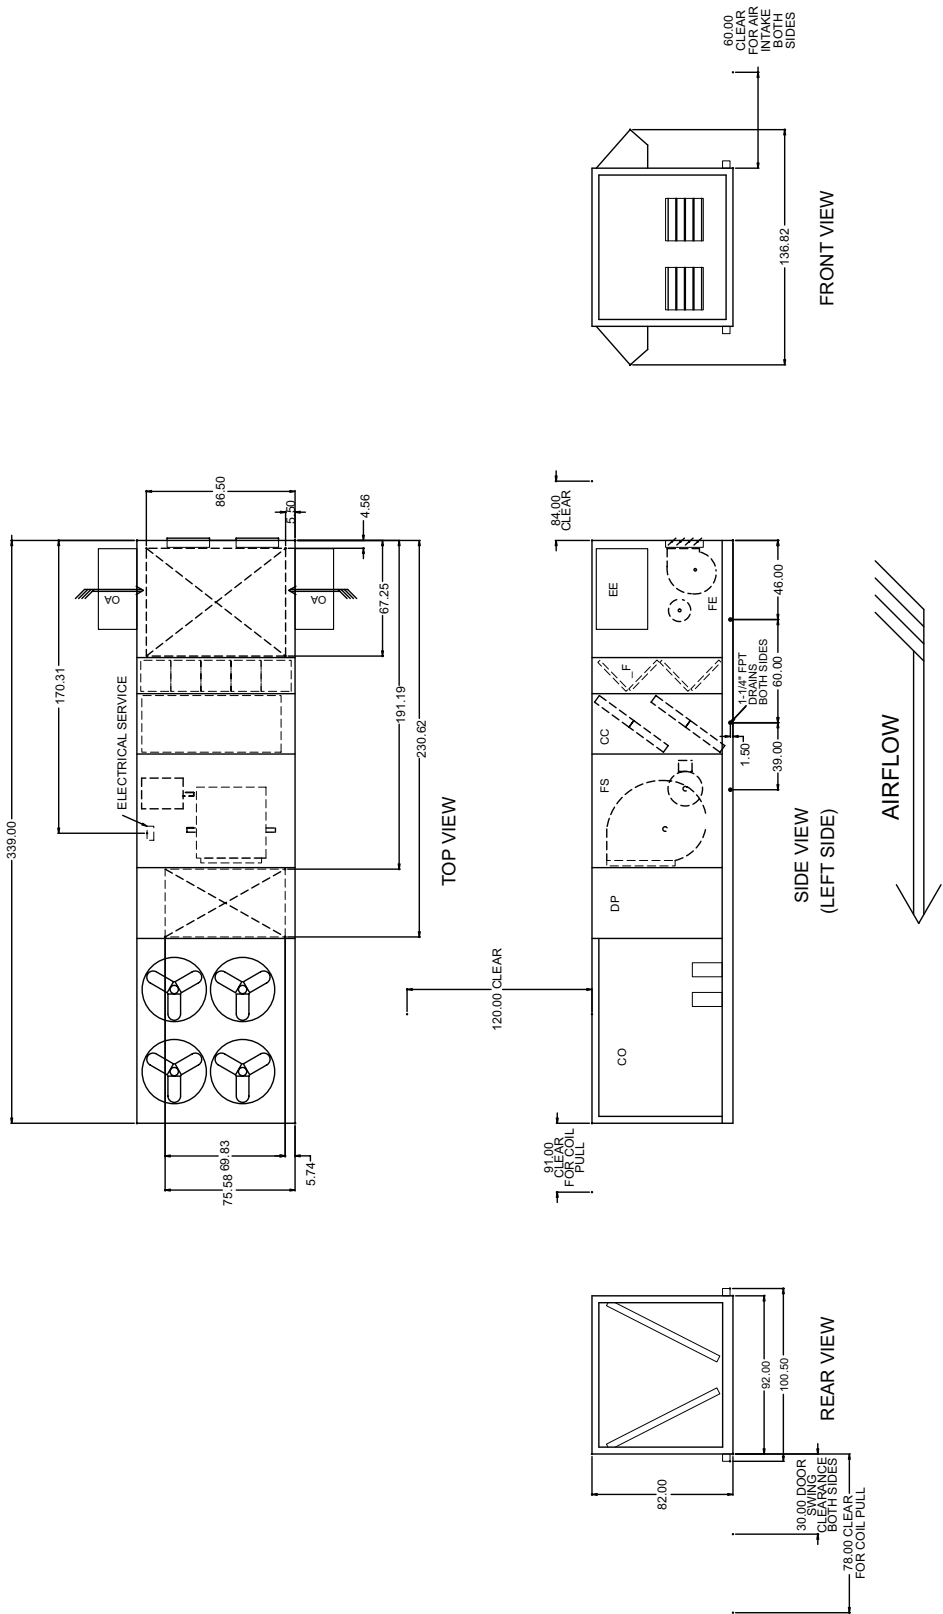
GENERAL ARRANGEMENT DRAWING
